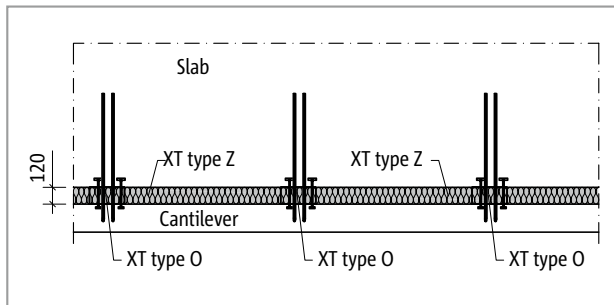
Schöck Isokorb® XT type O, Z: Corbel
